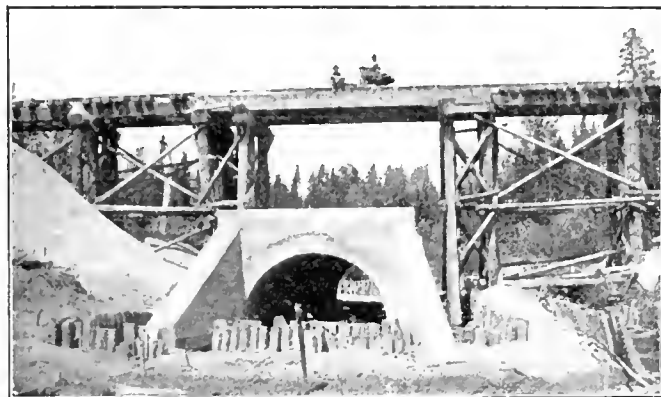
Typical Railroad Culvert in Earlier Stage of Construction.
